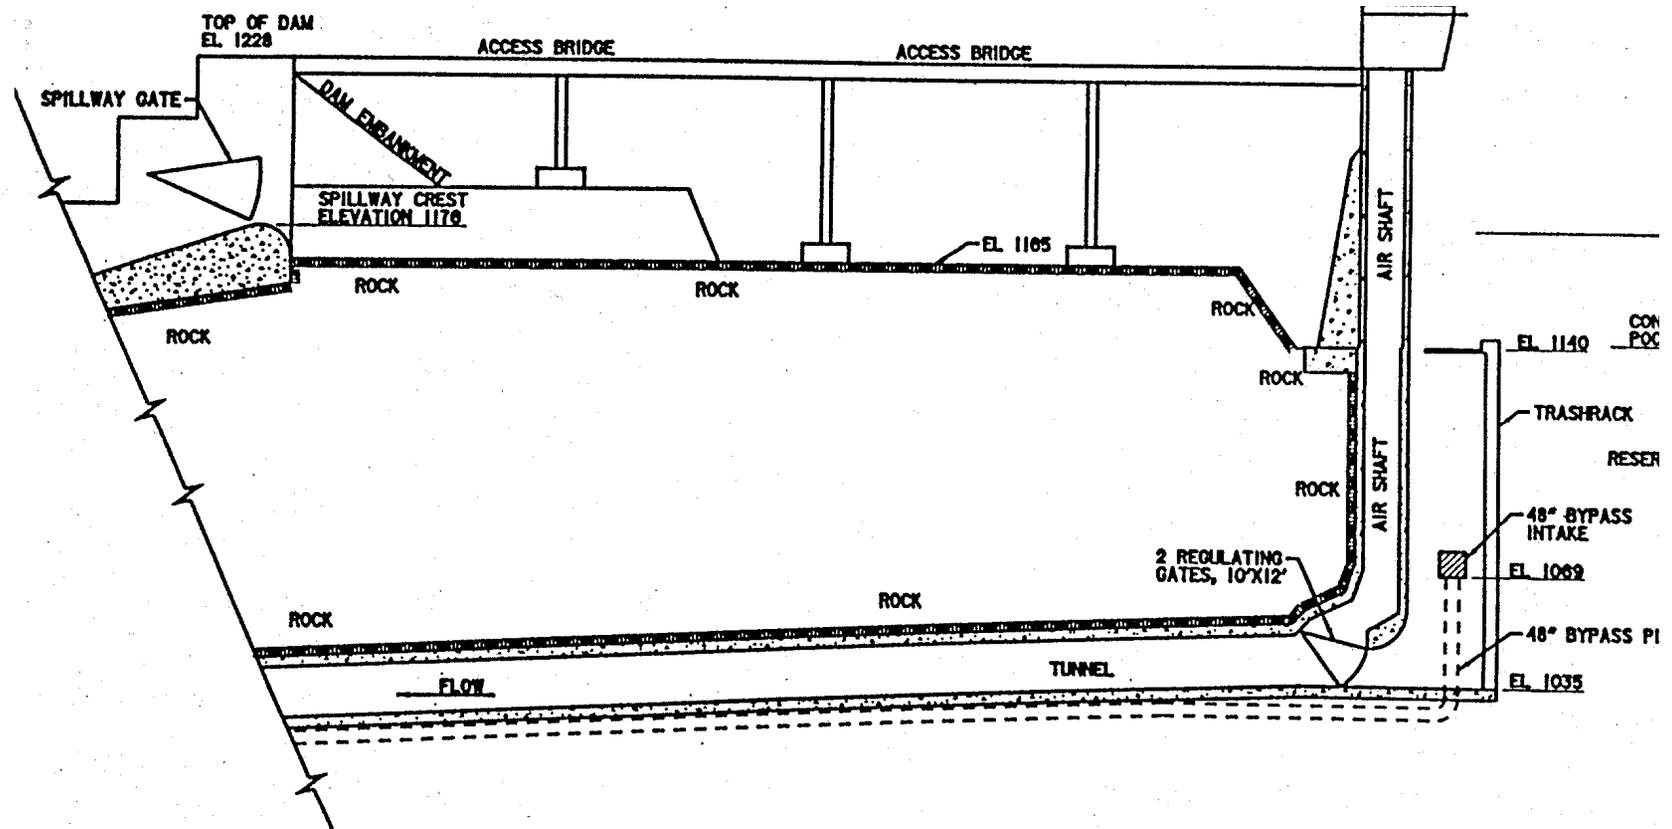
Cross section of Howard Hanson Dam (Source: USACE 1998).
